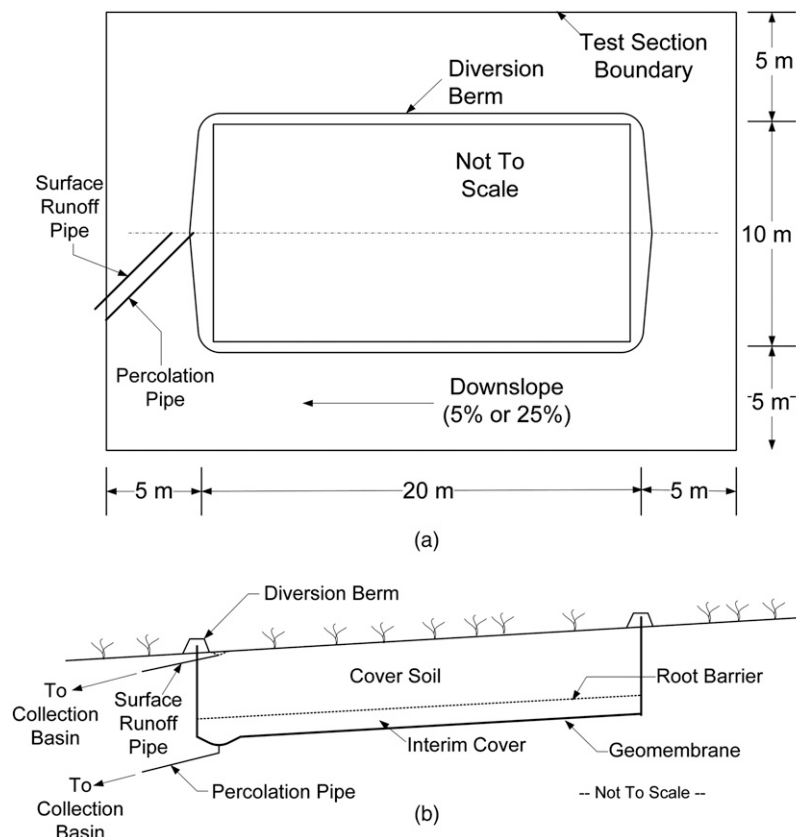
Schematic of ACAP test section and lysimeter: (a) plan view; (b) cross section
